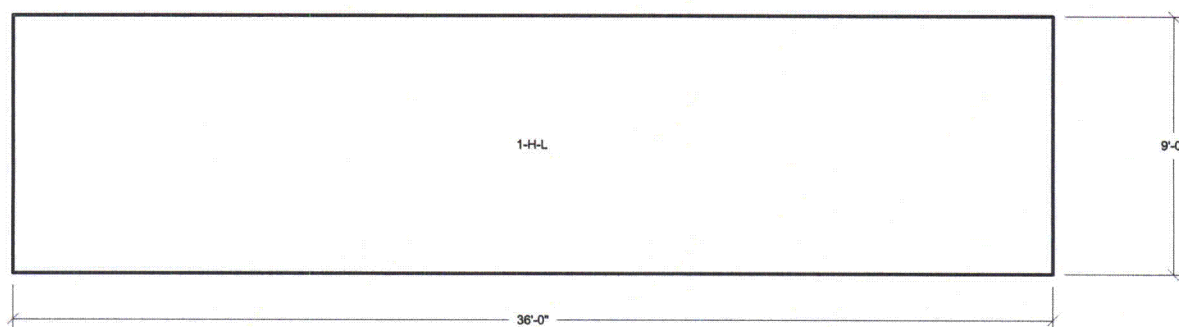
H.7-9: Access Region Walls Looking From Outside
